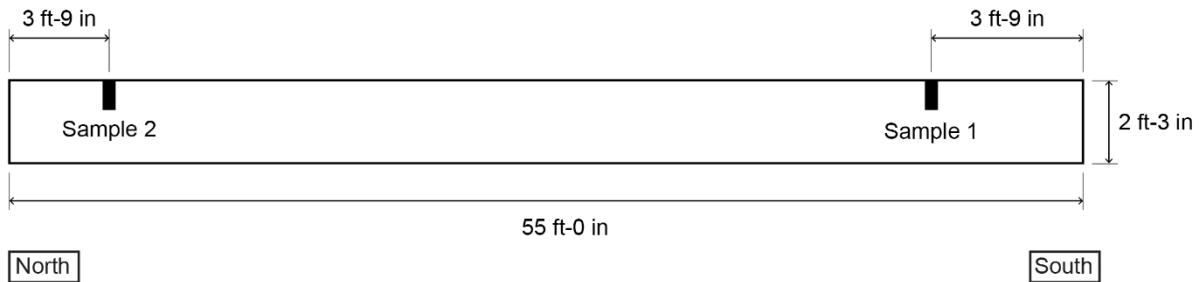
Location of Cores Taken from I-Beam 3. Elevation view of beam is shown.
